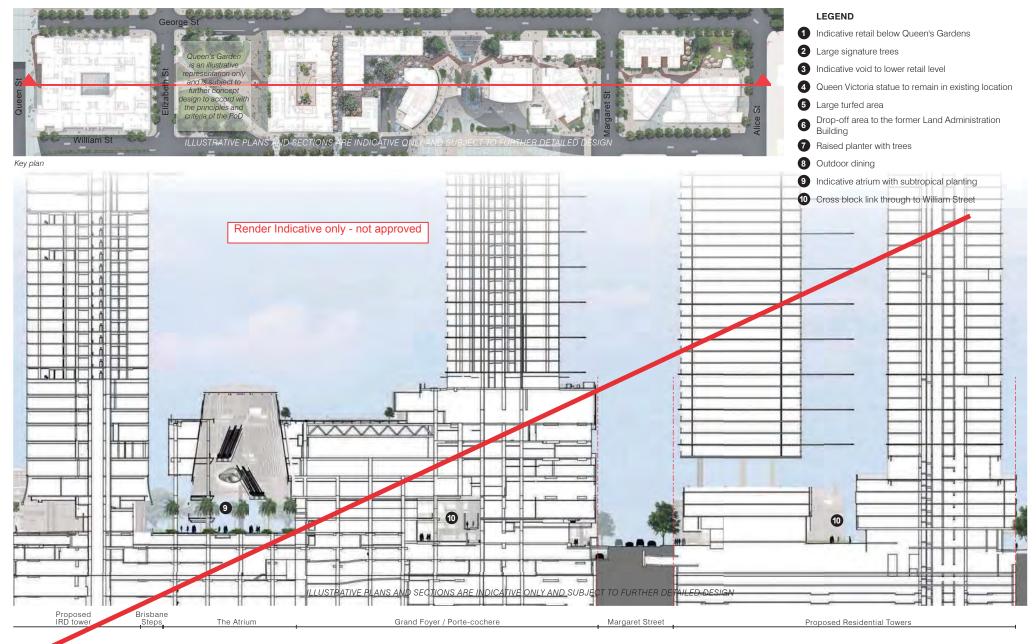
Ridgeline Sectional Elevation from the former Treasury Building to Alice Street (Not to scale)
